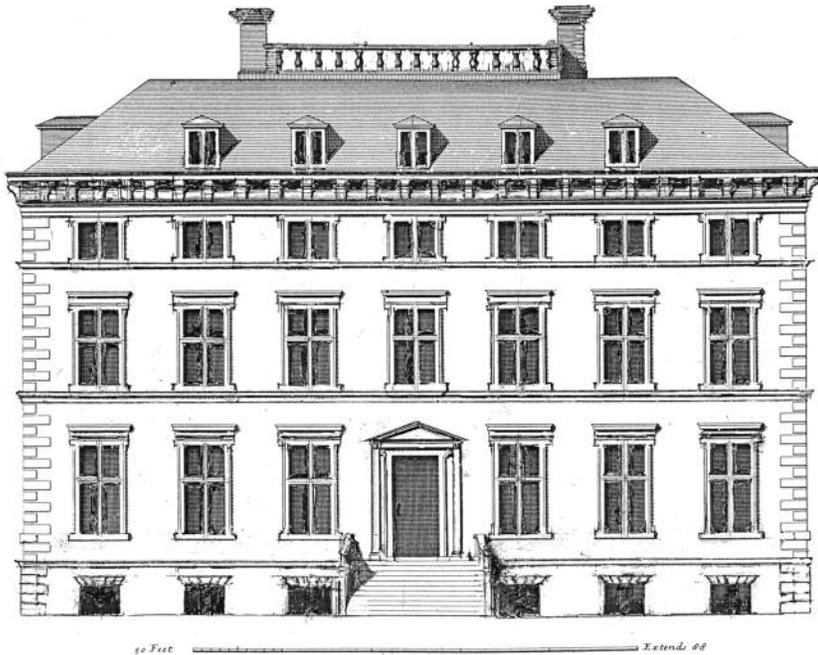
Chevening, north front: Campbell's elevation adapted to show details from the 1679 estate map.
